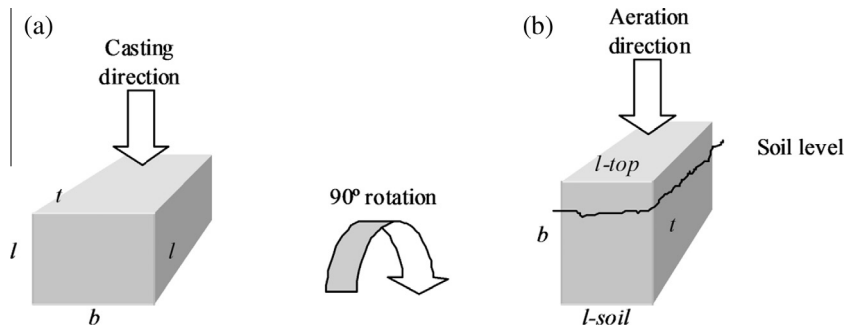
(a) Casting faces of specimens, (b) location of faces at the exposure field.
